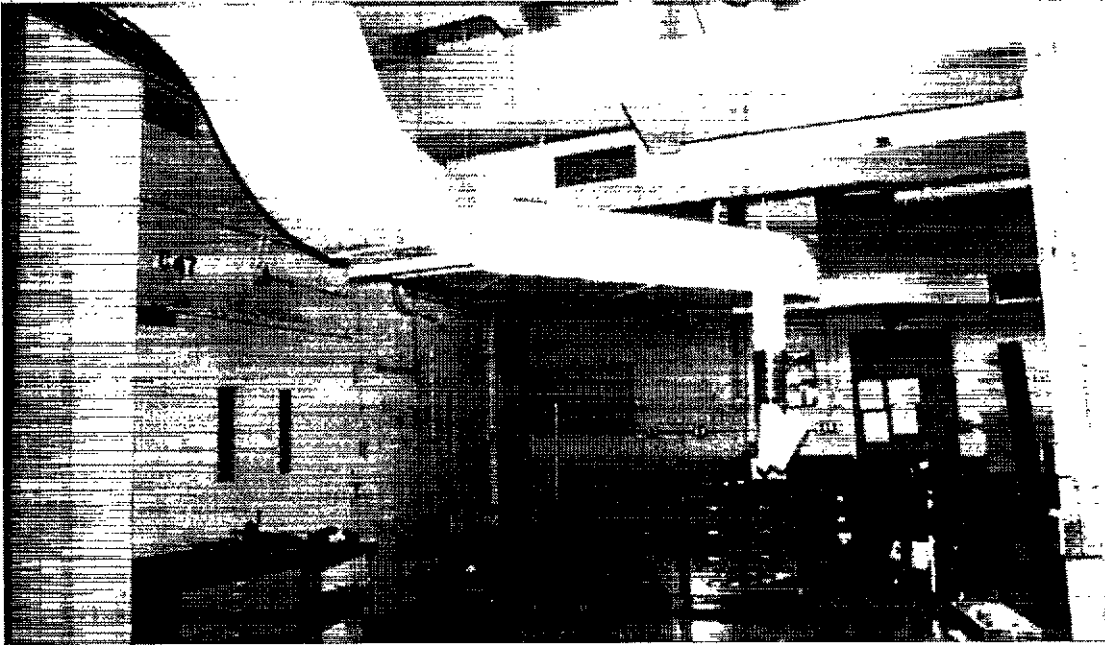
Typical furniture, equipment, piping, and ducting in the former Helium Laboratory.
